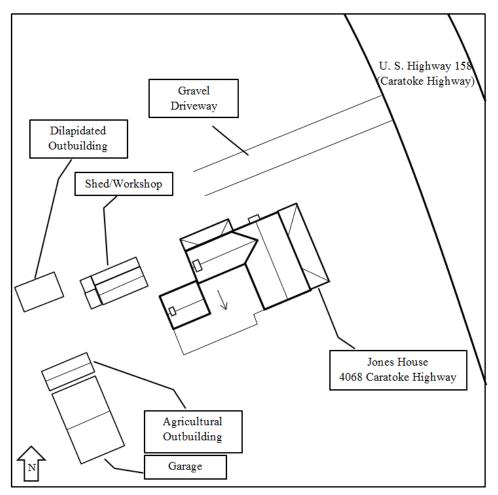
Site Plan of the Jones House, Not Drawn to Scale.
